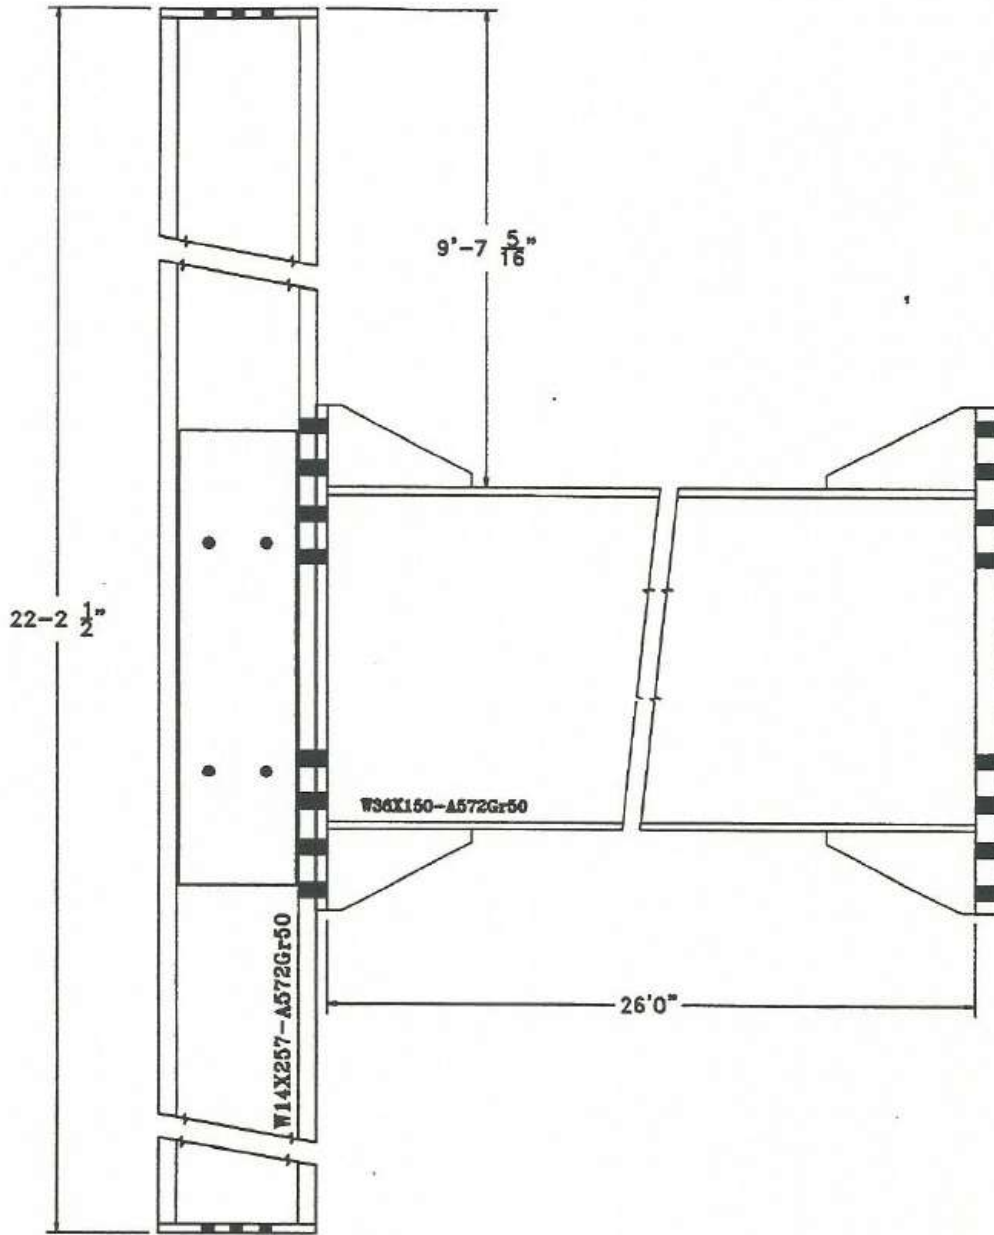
8ES-1.25-1-30 Specimen Dimensions [Sumner, E. A., Mays, T. W., & Murray, T. M. (2000). *Cyclic Testing of Bolted Moment End-Plate Connections*. Blacksburg, VA: Virginia Polytechnic Institute and State University, Used with Permission of T.M. Murray, 2015]
